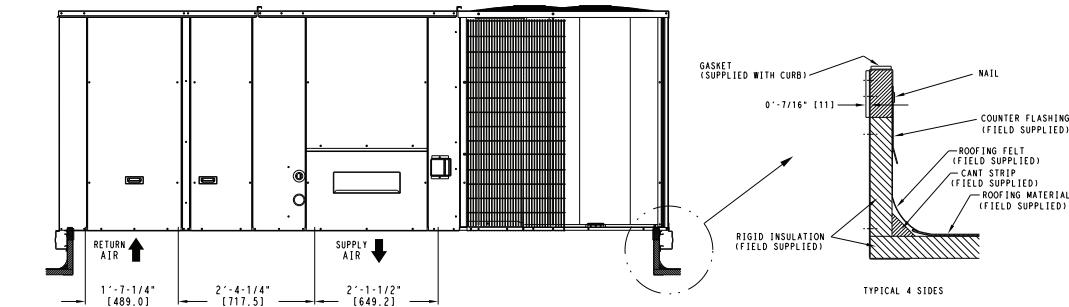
50TC\*\*17 and 20 Roof Curb Details
